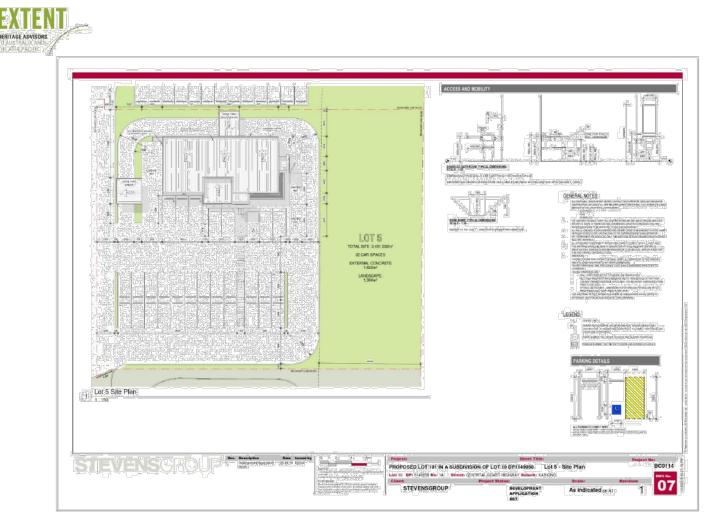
Design Plan of Lot 5, showing the footprint of the Oporto Restaurant development (source: Stevens Group; Project No. BC0114; Drawing No.07).
